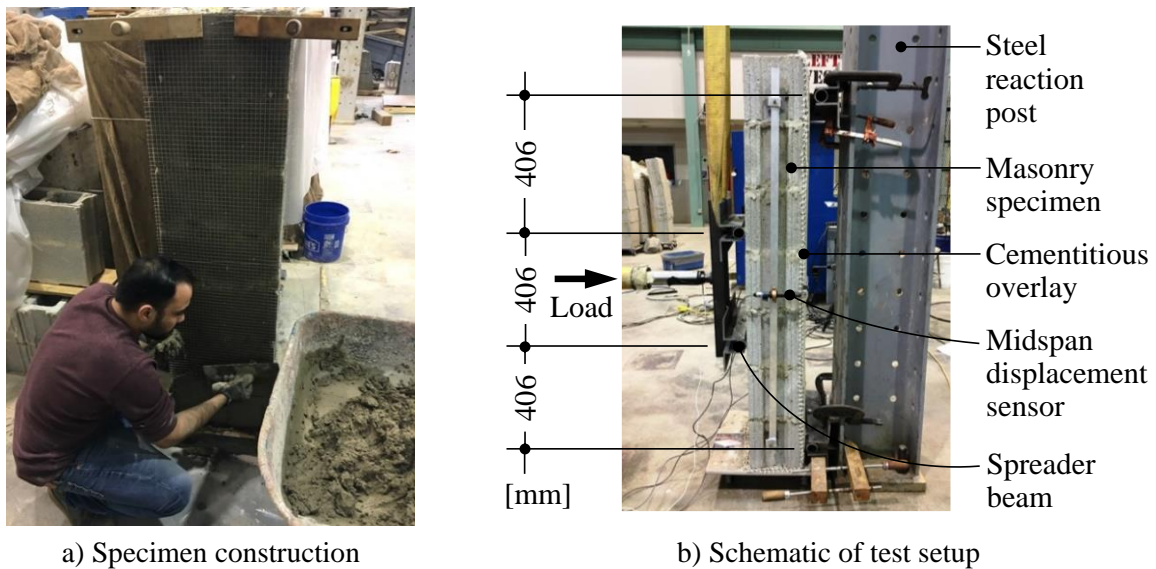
Out-of-plane testing of substandard cinder-block masonry specimens.
